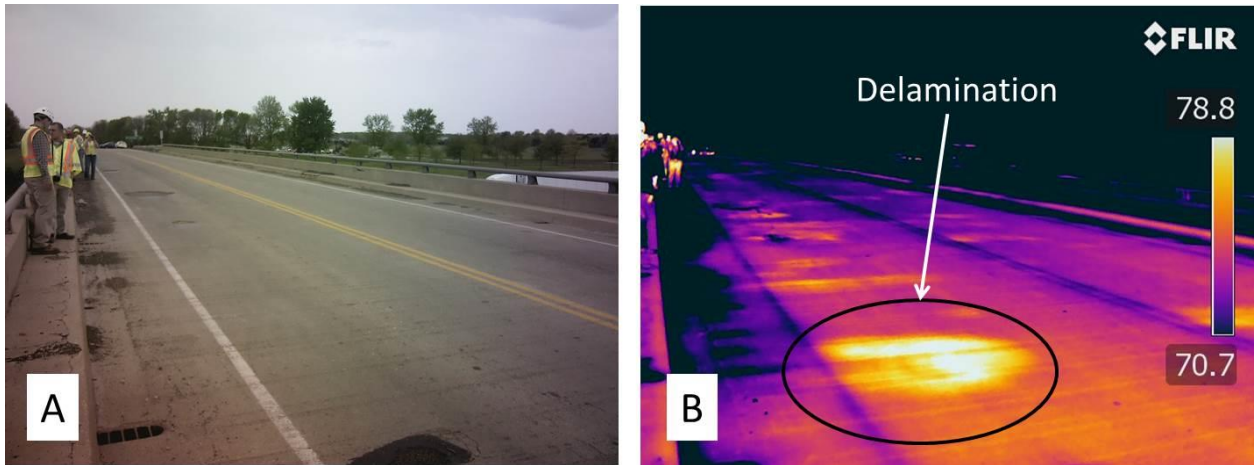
Photograph of a bridge deck (A) and an IR image of the same deck area showing a subsurface delamination (B).
